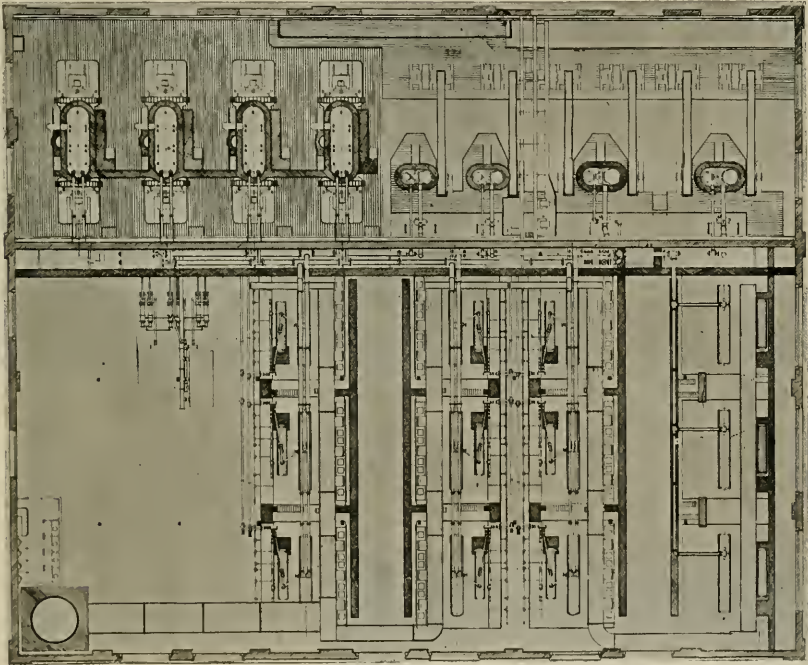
GROUND PLAN, BRYANT STREET STATION, SAN FRANCISCO.
